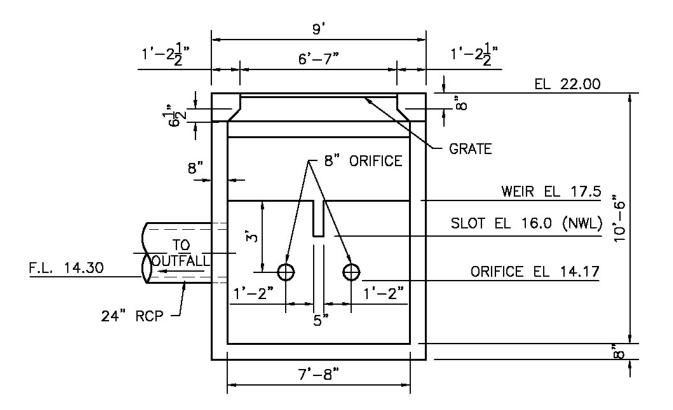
Schematic of the Navy Canal Pond Outfall Structure.
